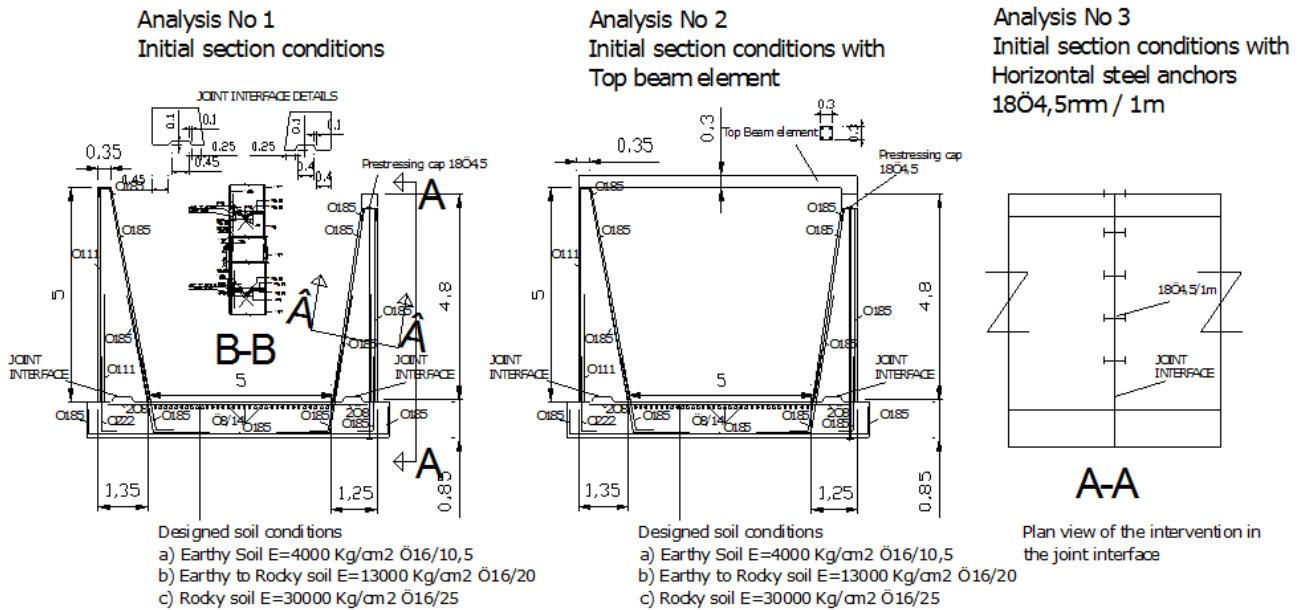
Typical reinforcement details of the canal section in the area of failure \*distances cm.
